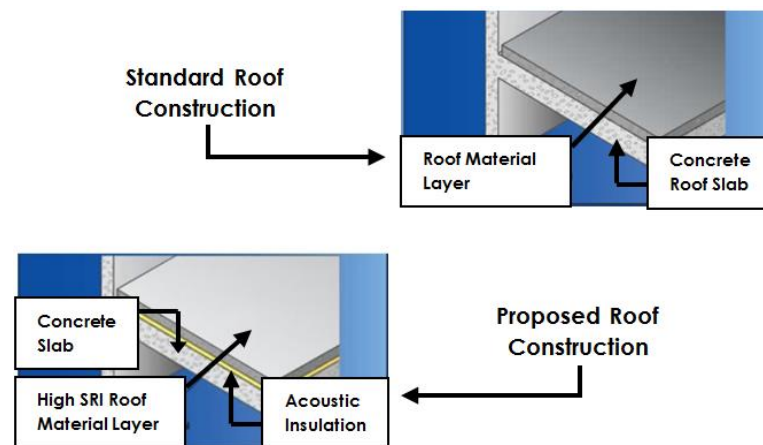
Graphic illustrating the standard roof construction compared to the proposed roof construction
